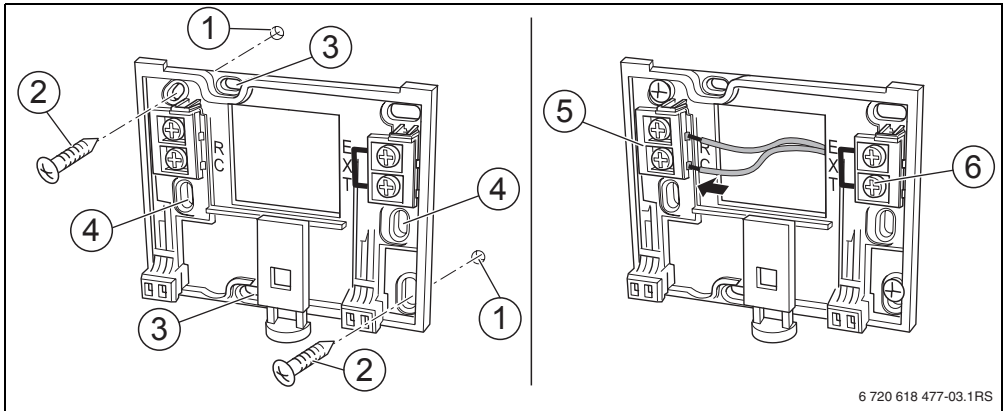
Mounting the wall mounting base (left) and the electrical connection (right)
